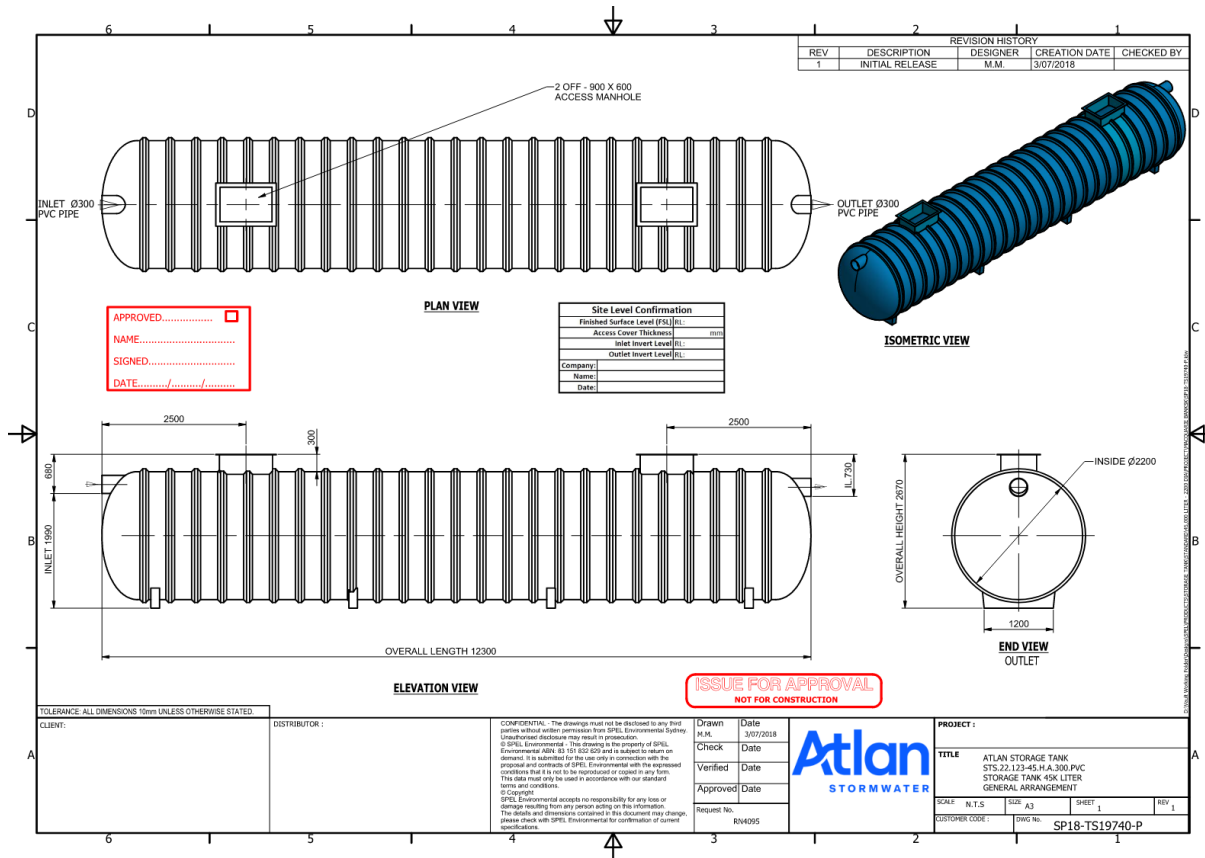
Atlon Tankstor Spill Containment Tank Typical Detail
